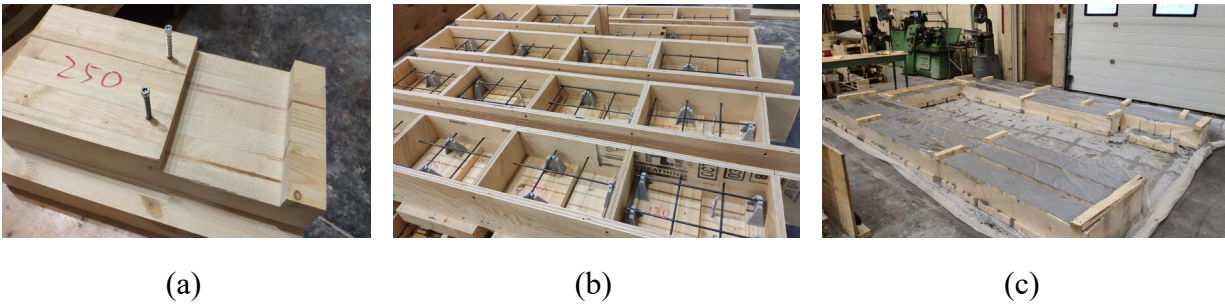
Notched connection specimen preparation (a) Timber after notch cutting and screw drilling (b) Formworks and steel mesh (c) Specimens after concrete casting.
